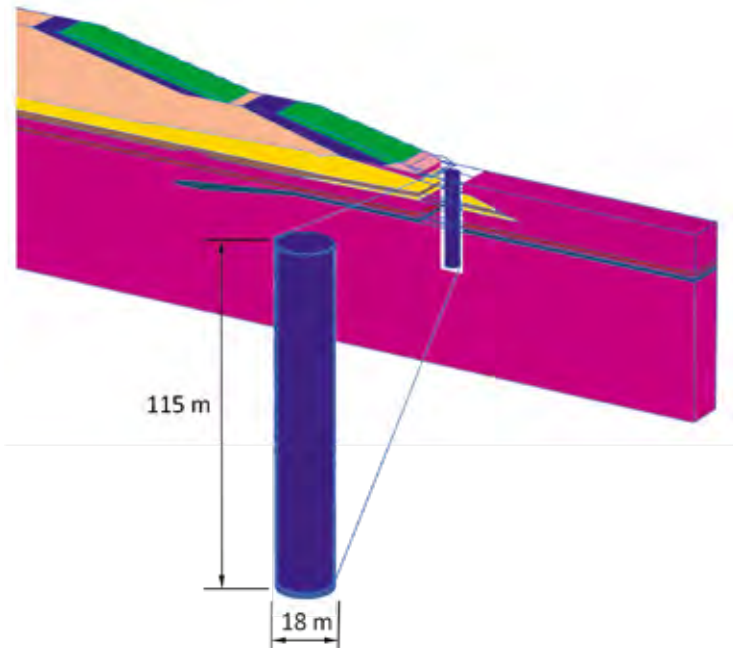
A 3D FE-model of on section of the dam with deep vertical shafts.
